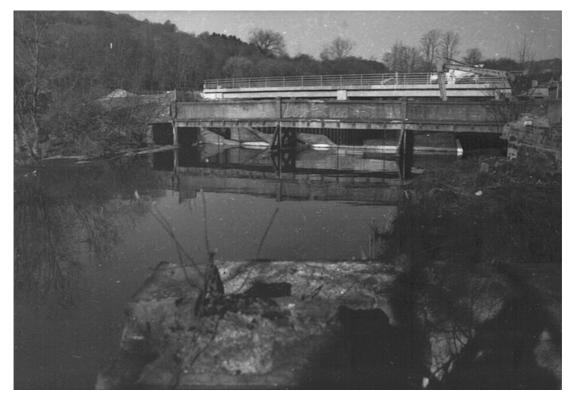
South-east-facing elevation of Sterne Bridge (MF SB01_01)
